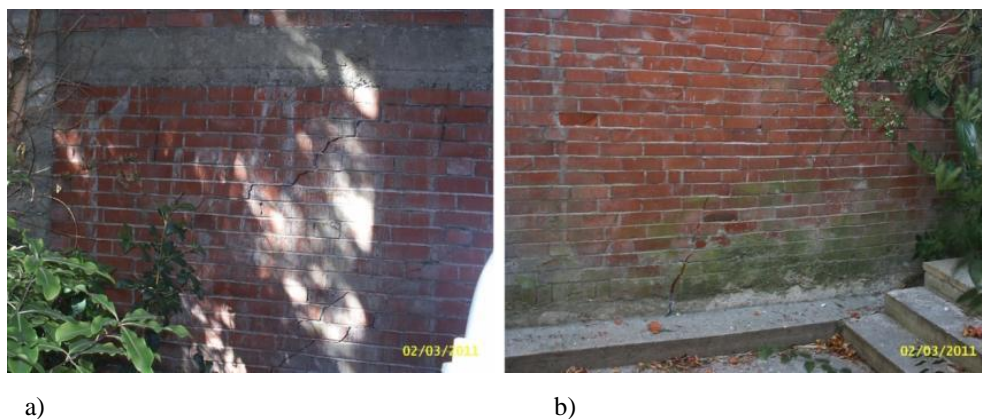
Observed damage on masonry infills after the 22<sup>nd</sup> February 2011 Christchurch earthquake: a) Diagonal cracking, b) Close up view of the diagonal cracking
